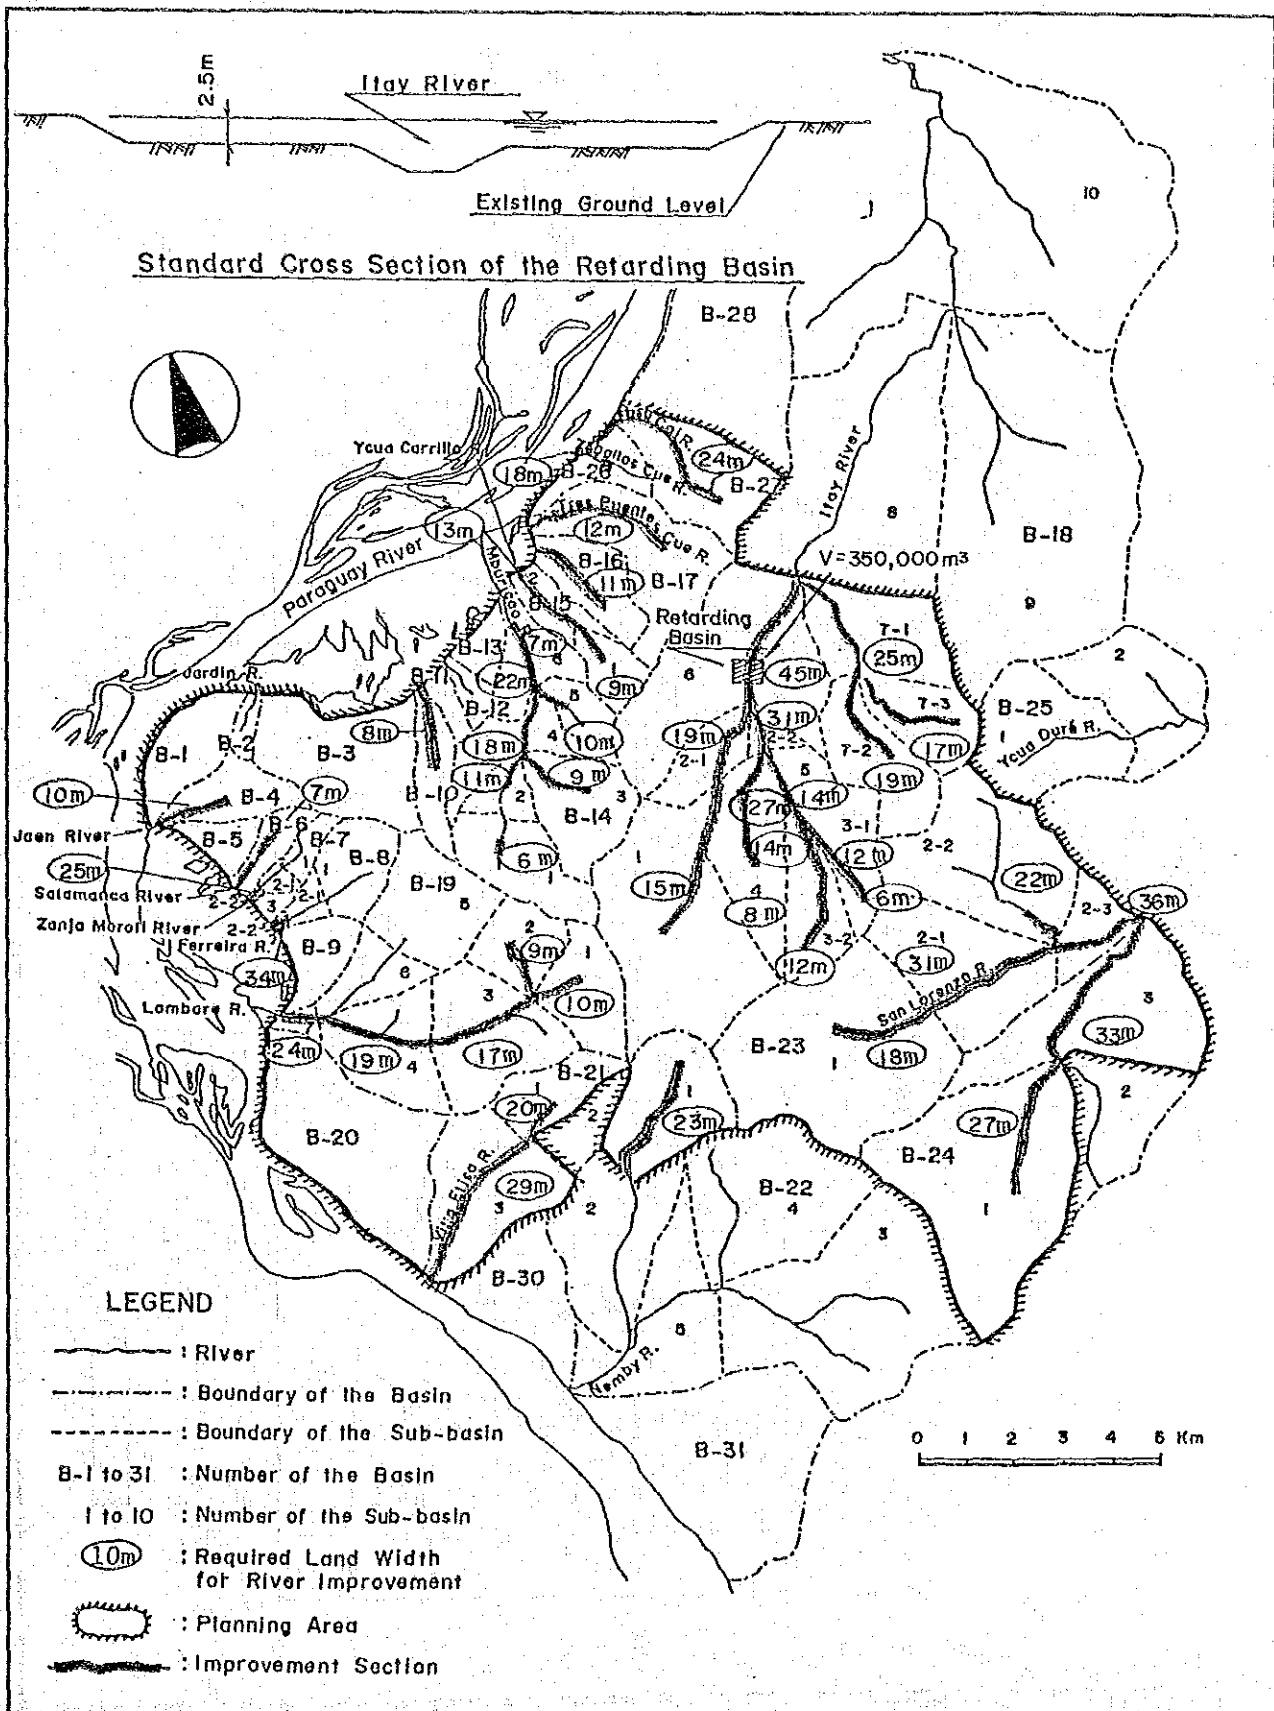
LAYOUT OF PROPOSED RIVER CHANNEL IMPROVEMENT PORTION FOR MASTER PLAN
